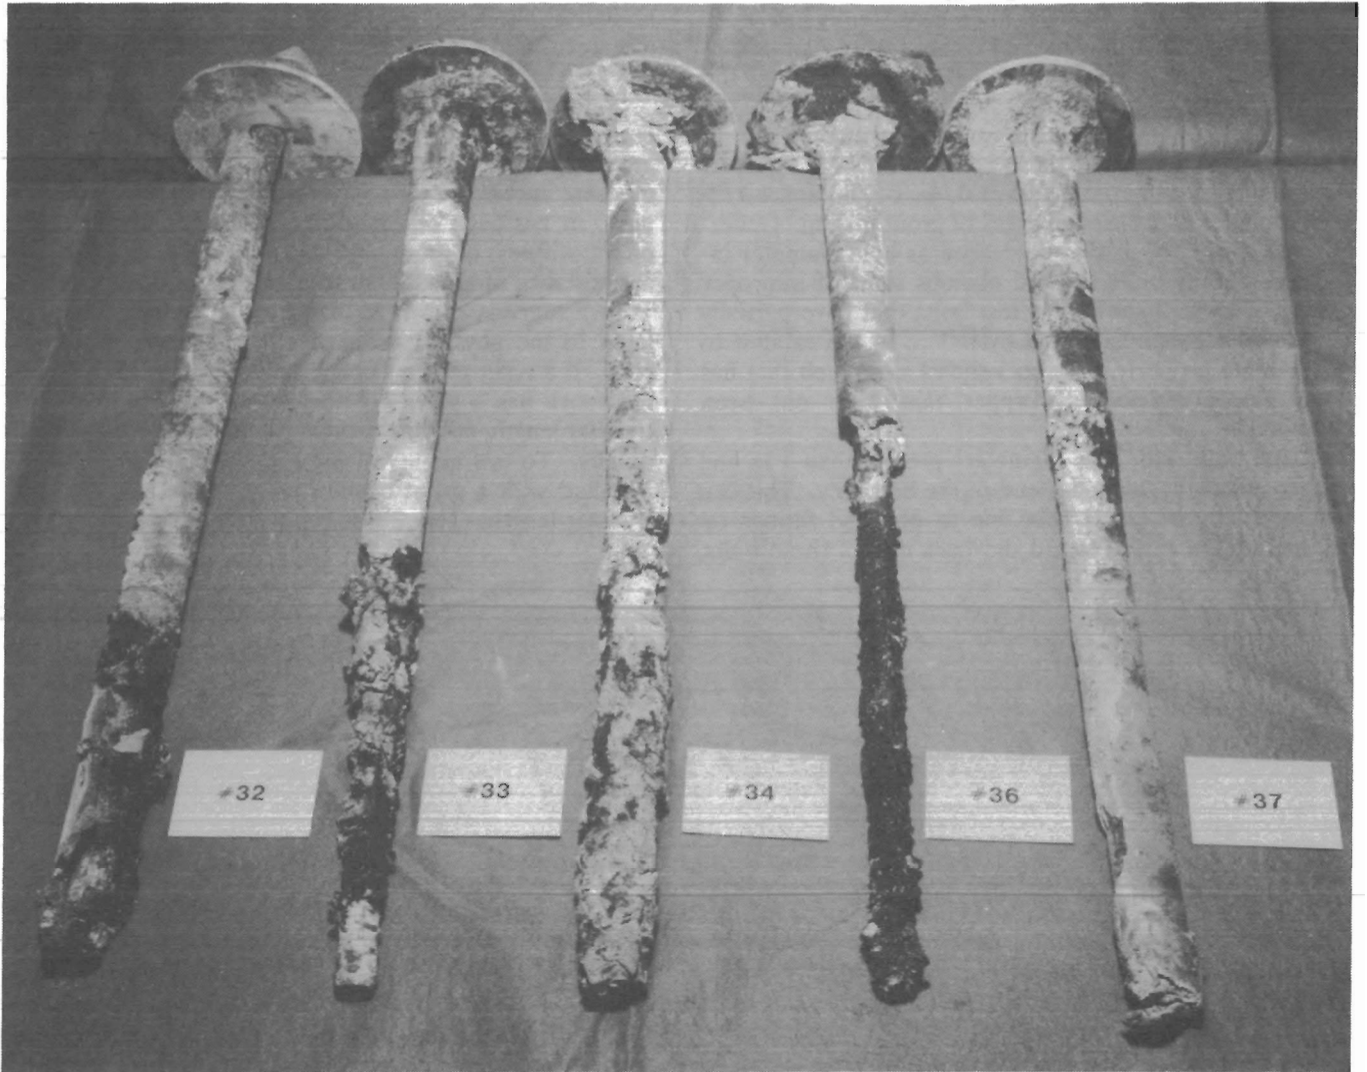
Bolts from 1-3/8-in-diam holes, test 1.
